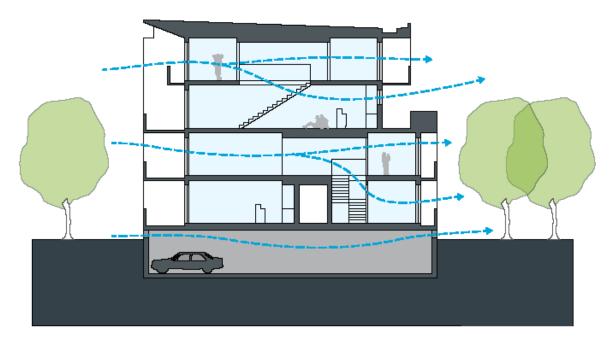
Examples of Apartments Achieving Effective Natural Cross Ventilation (from Apartment Design Guide, section elevation of a typical residential building)
